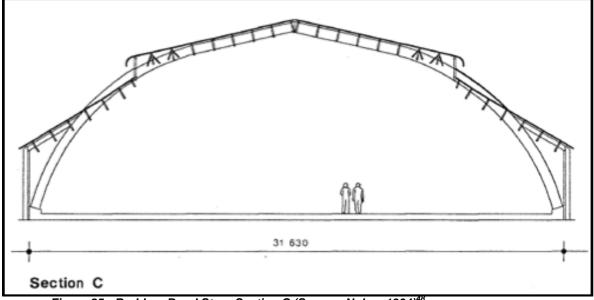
Rudders Bond Store Section C (Source: Nolan, 1994)48
